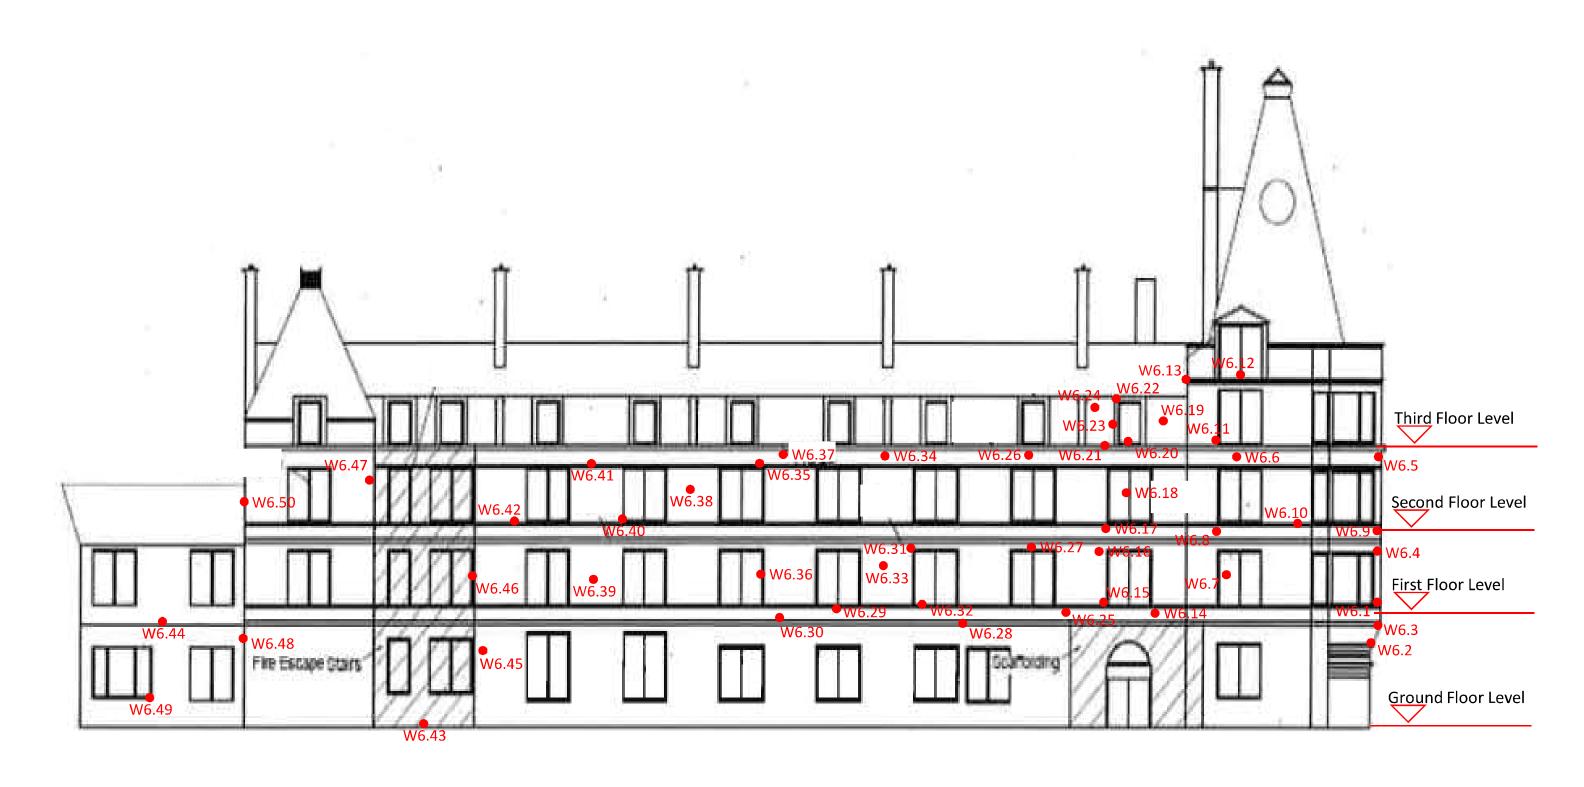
Elevation W6 of Station Hotel Building showing Defect/Observation Locations
